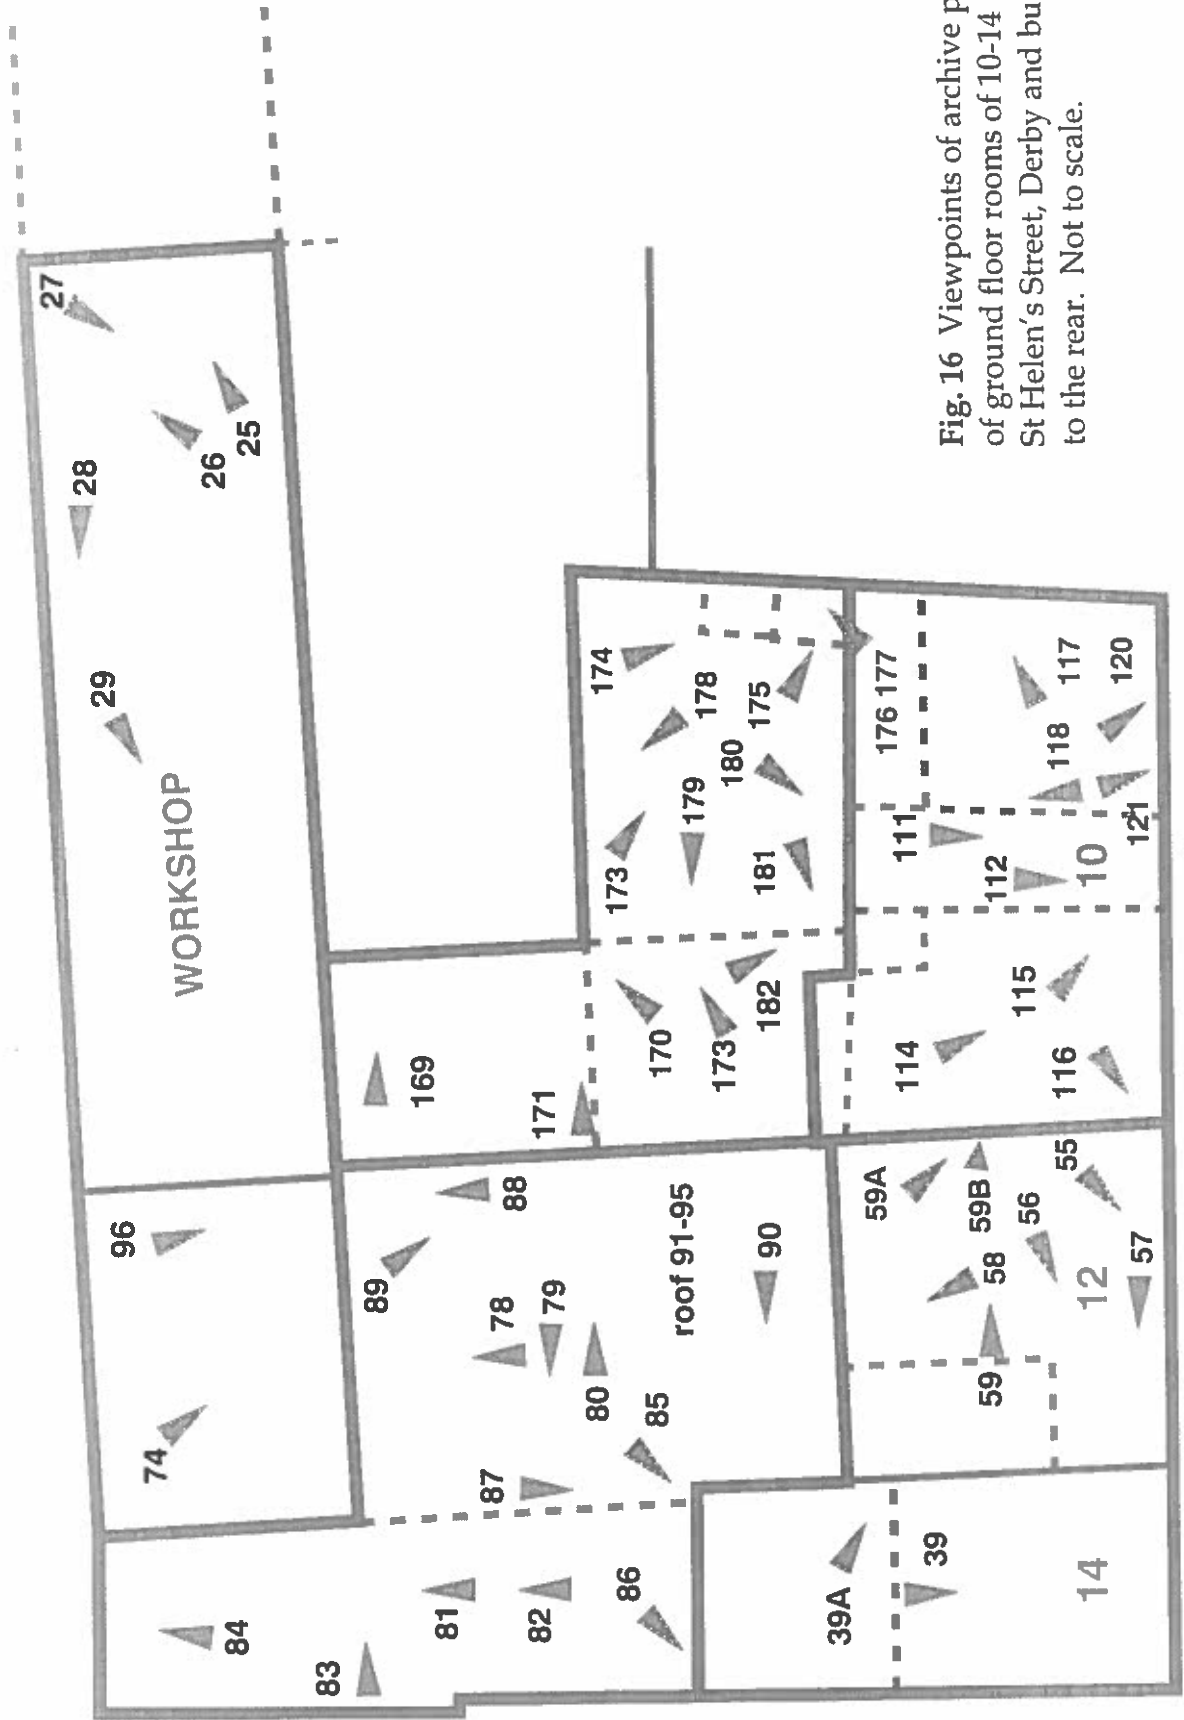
Viewpoints of archive photos of ground floor rooms of 10-14 St Helen's Street, Derby and buildings to the rear. Not to scale.
